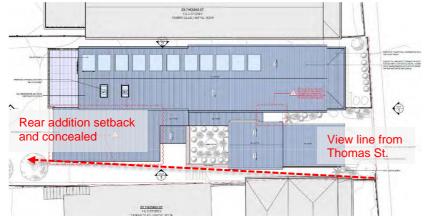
Roof plan showing direction of view between 22 and 24 Thomas Street. The drawing shows the rear additions set back from the south boundary which help conceal it from Thomas Street.
